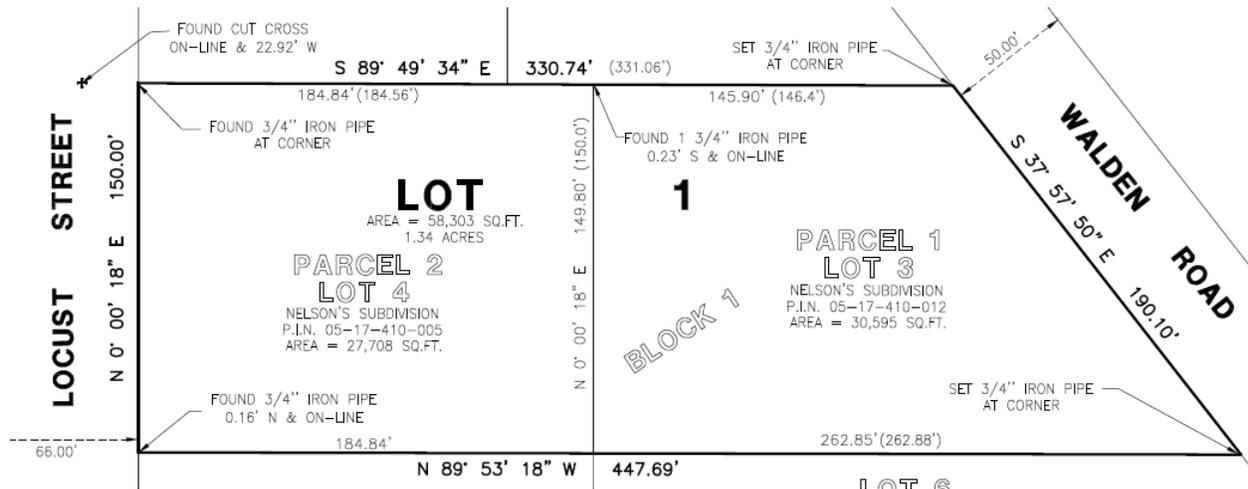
Excerpt of Proposed St. John's Subdivision Plat
